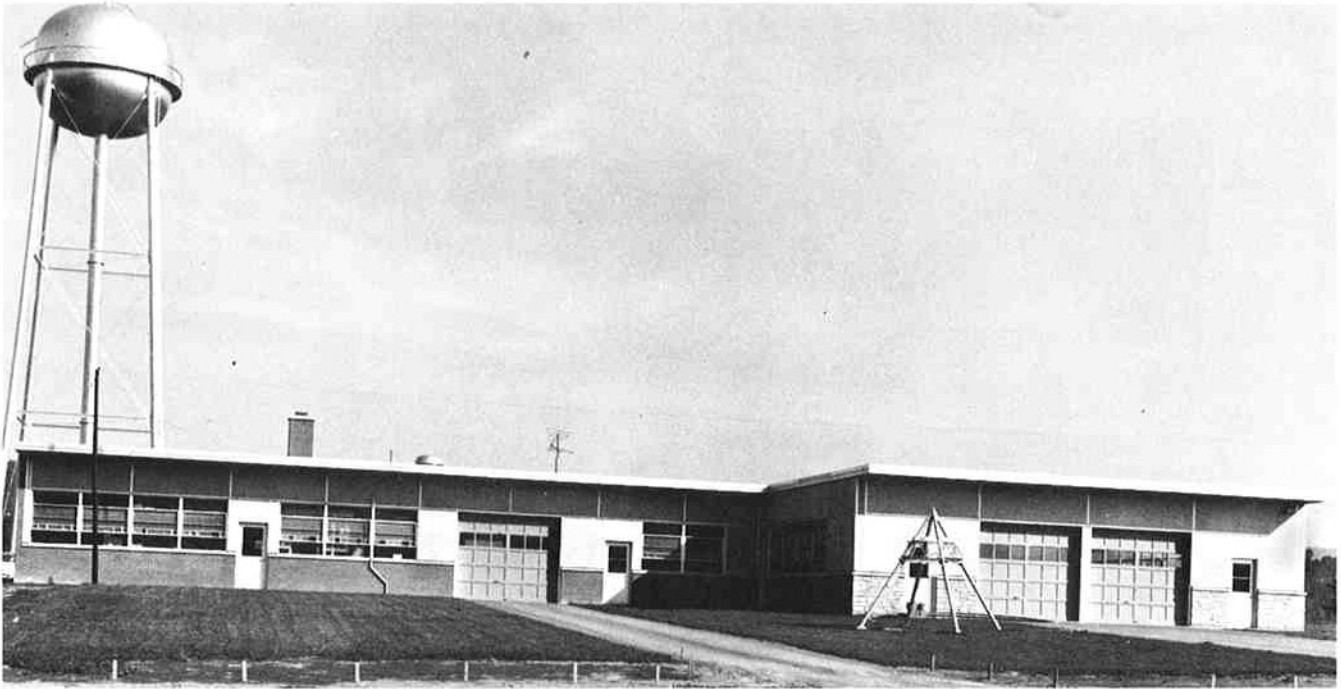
A view of the west side of the Works Area building. Site maintenance shops (carpentry, plumbing, electrical, etc.) will be located in the south wing, which extends eastward parallel to the main road. Vehicular repair, receiving and shipping, and power and heating facilities are located in the central section. A full-scale wooden model of the focal apparatus support system of the Howard E. Tatel telescope is standing on the lawn in front of the building.
